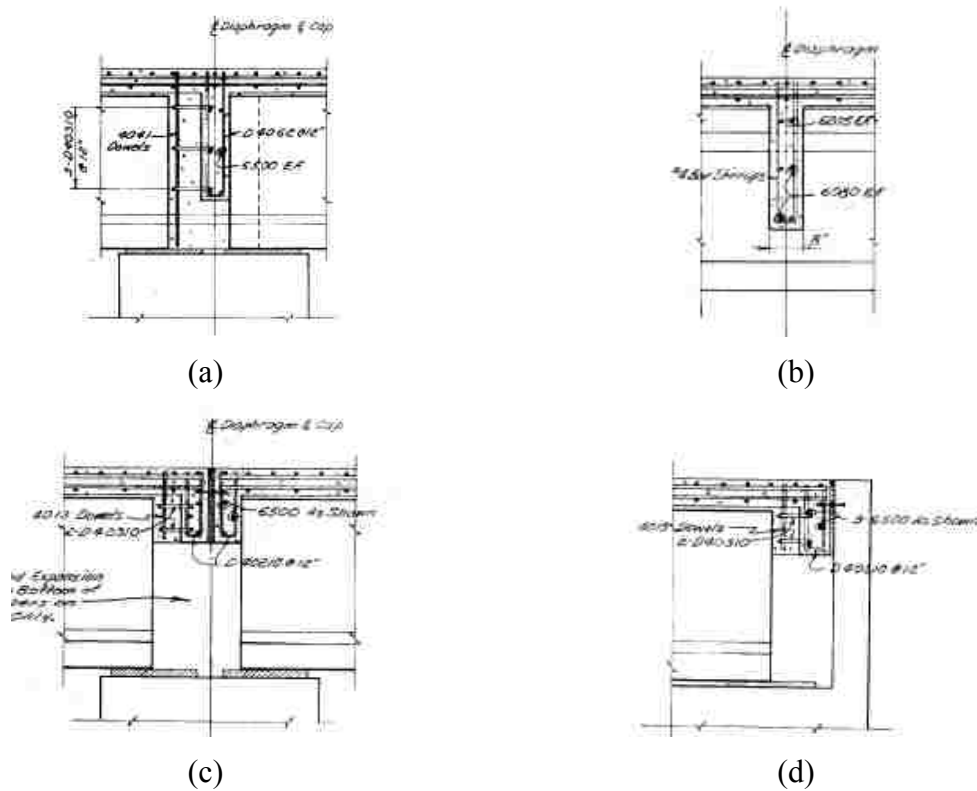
Bridge G-1064 - Cross diaphragms at (a) fixed bearing; (b) interior diaphragm; (c) expansion joint; and (d) abutment expansion joint
